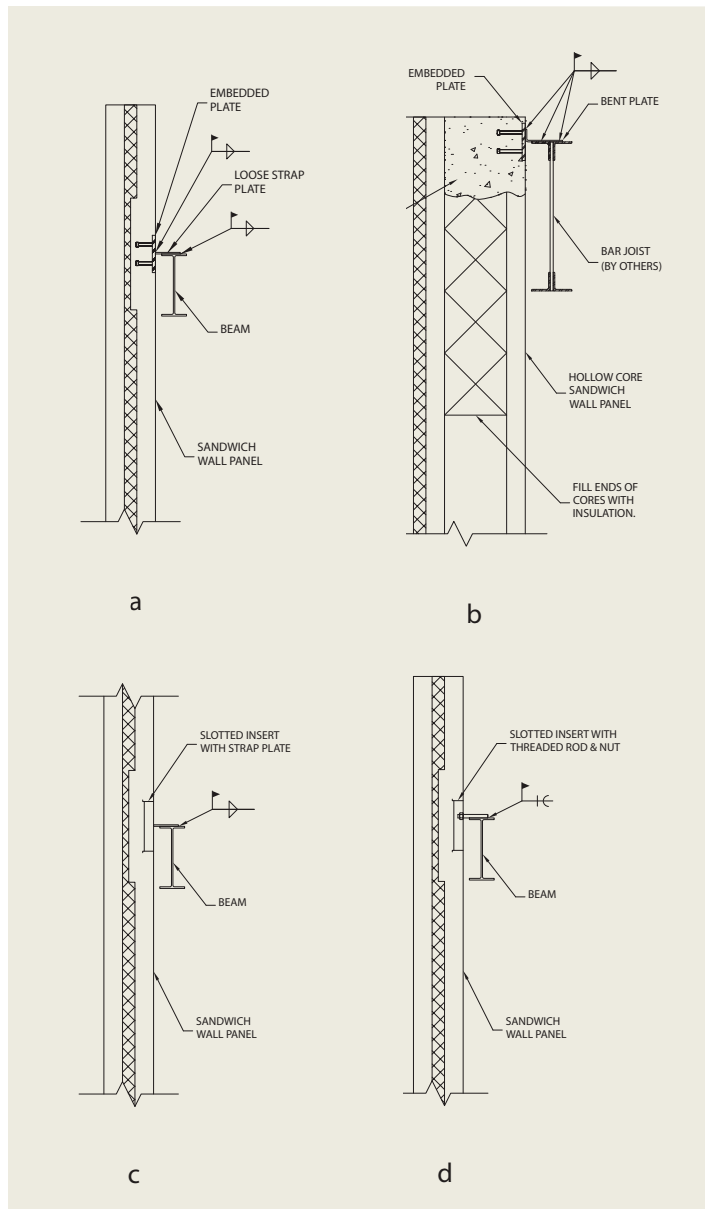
Non-load-bearing panels to beam or joist connections.
